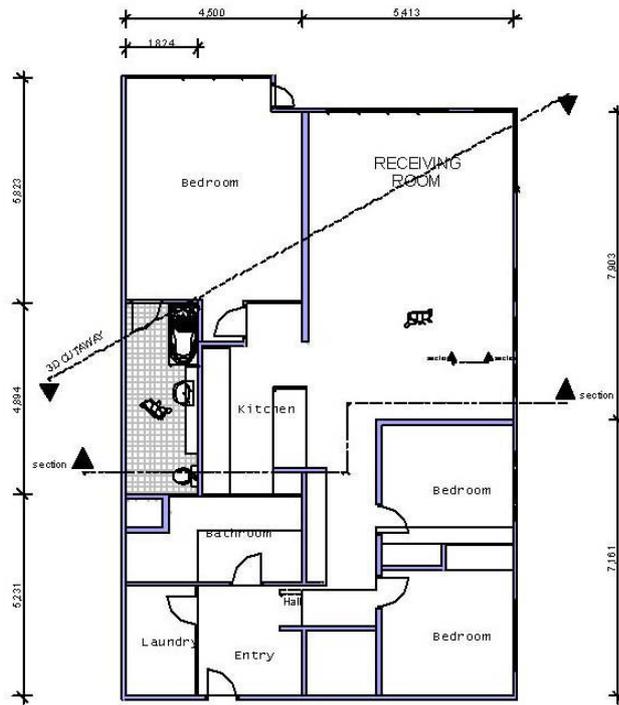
FLOOR PLAN – RECEIVING ROOM
